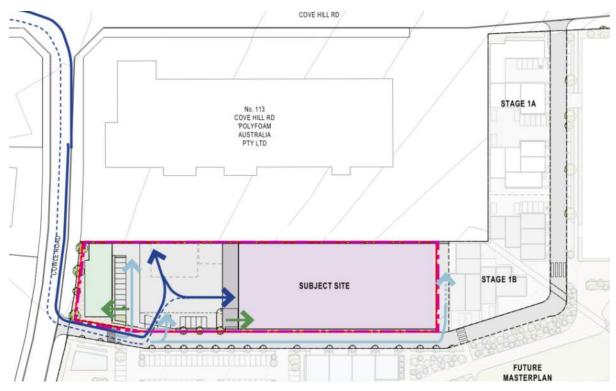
Site plan showing location of SJAH facility in relation to previously approved stages
